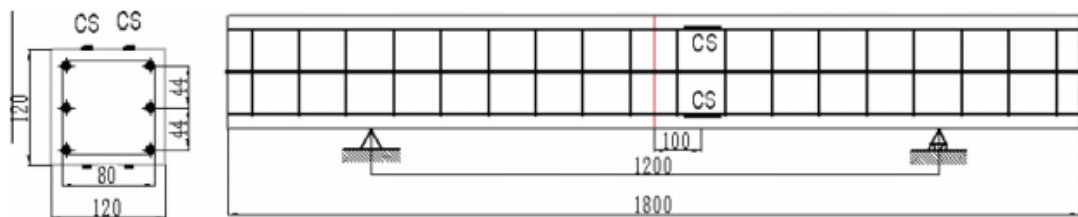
Reinforcement layout in Zhan, Wang [65]
